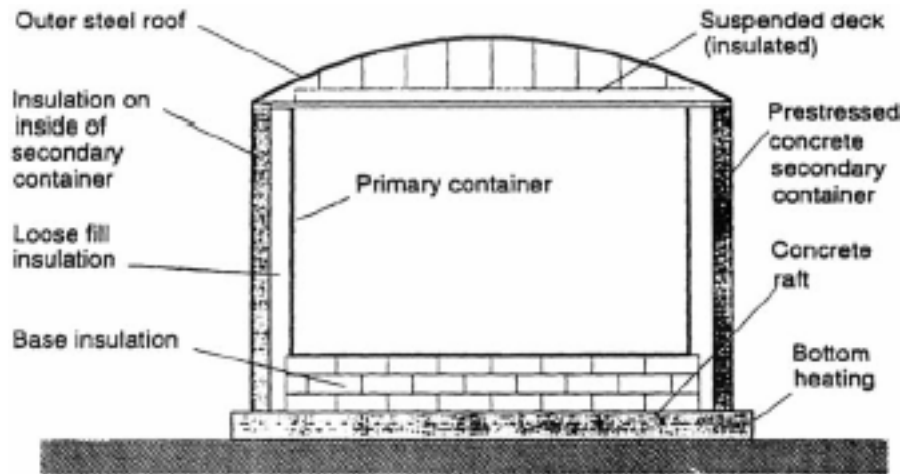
The primary and secondary containment tanks for a "full containment" storage tank of the type to be used at the proposed Harpswell LNG terminal.
